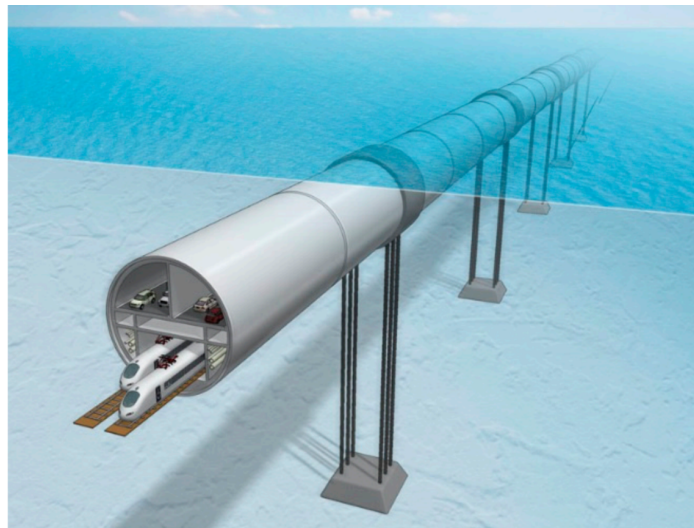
Tether stabilized submerged floating tunnel,[Won et al., 2019]
